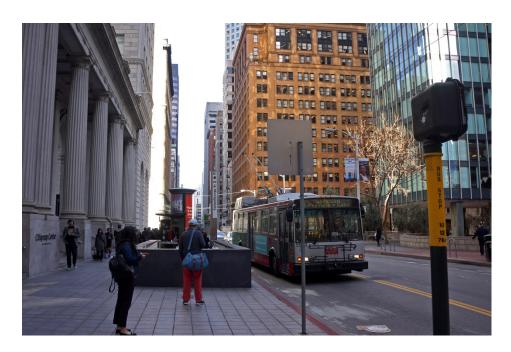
Existing View of Montgomery Street Station entrance/exit looking north along Sansome Street near Sutter Street – Site of Proposed Canopy 7
